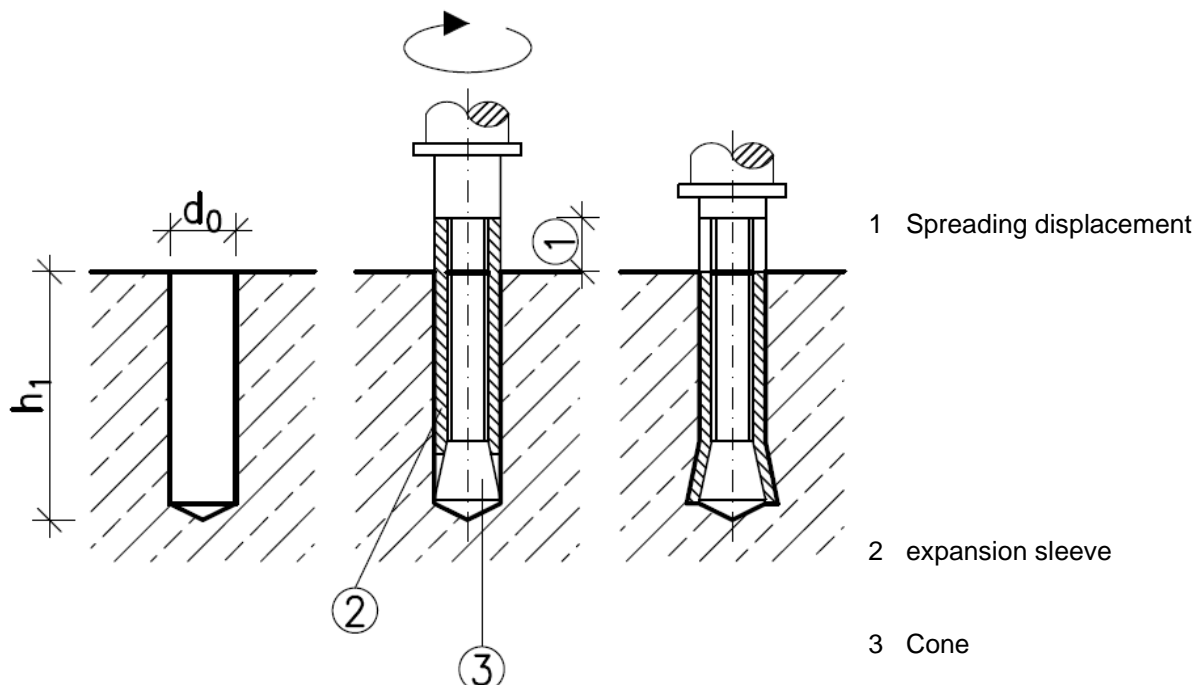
Fastener installation by rotating the fastener sleeve, e.g., by means of the drilling machine; thereby undercutting the concrete and forcing the sleeve over the cone. To facilitate the undercutting, the end of the fastener sleeve can be specially designed (e.g., with cutting pins)
